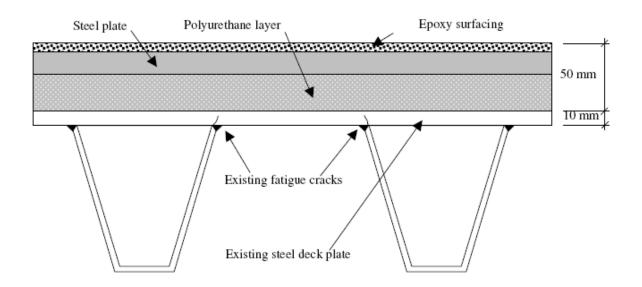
Renovation using steel plate connected with polyurethane foam
